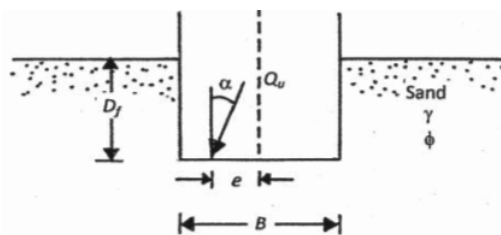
Shallow foundation on granular soil subjected to eccentrically inclined load.
